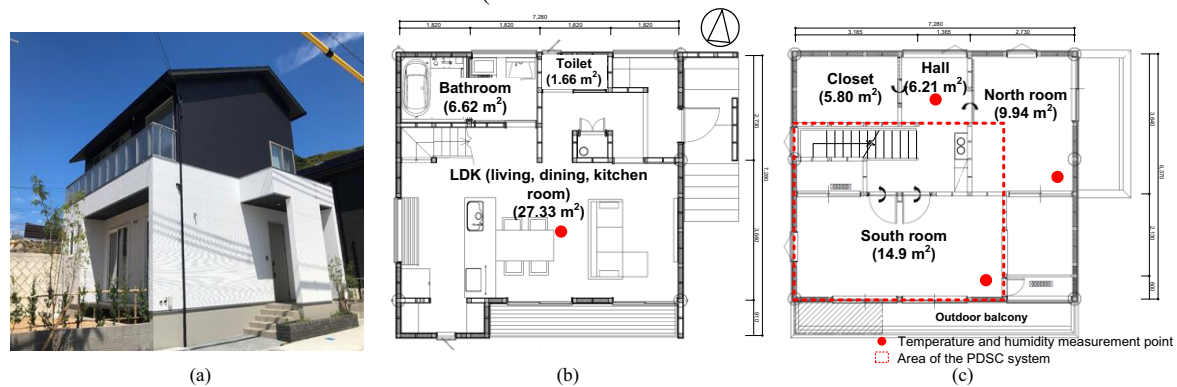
Demonstrated house (a) Exterior appearance, (b) first floor plan, and (c) second floor plan.
